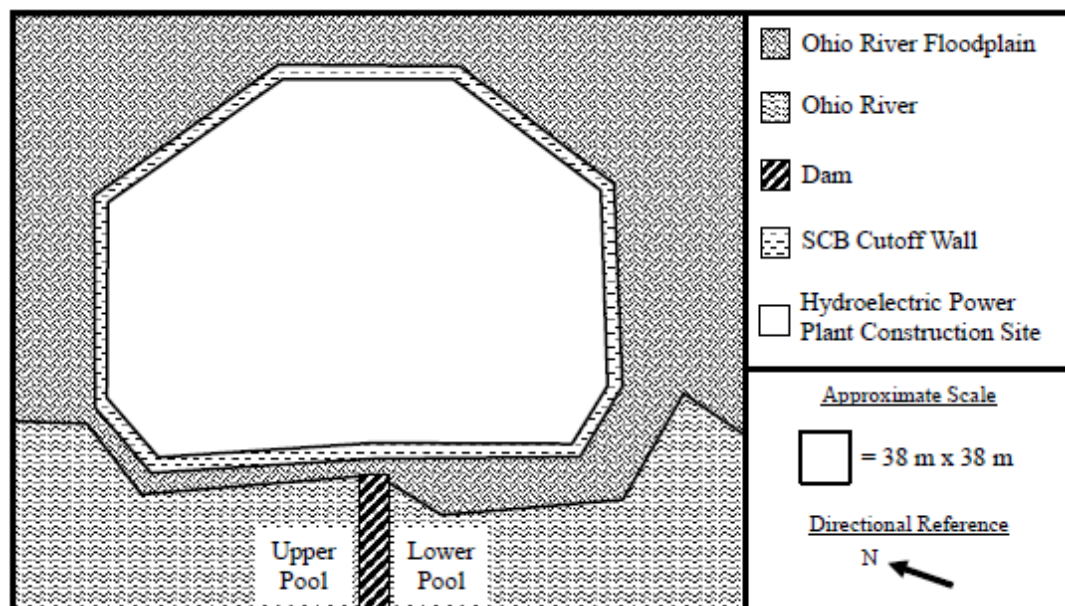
Plan View of the SCB cutoff wall in Smithland
